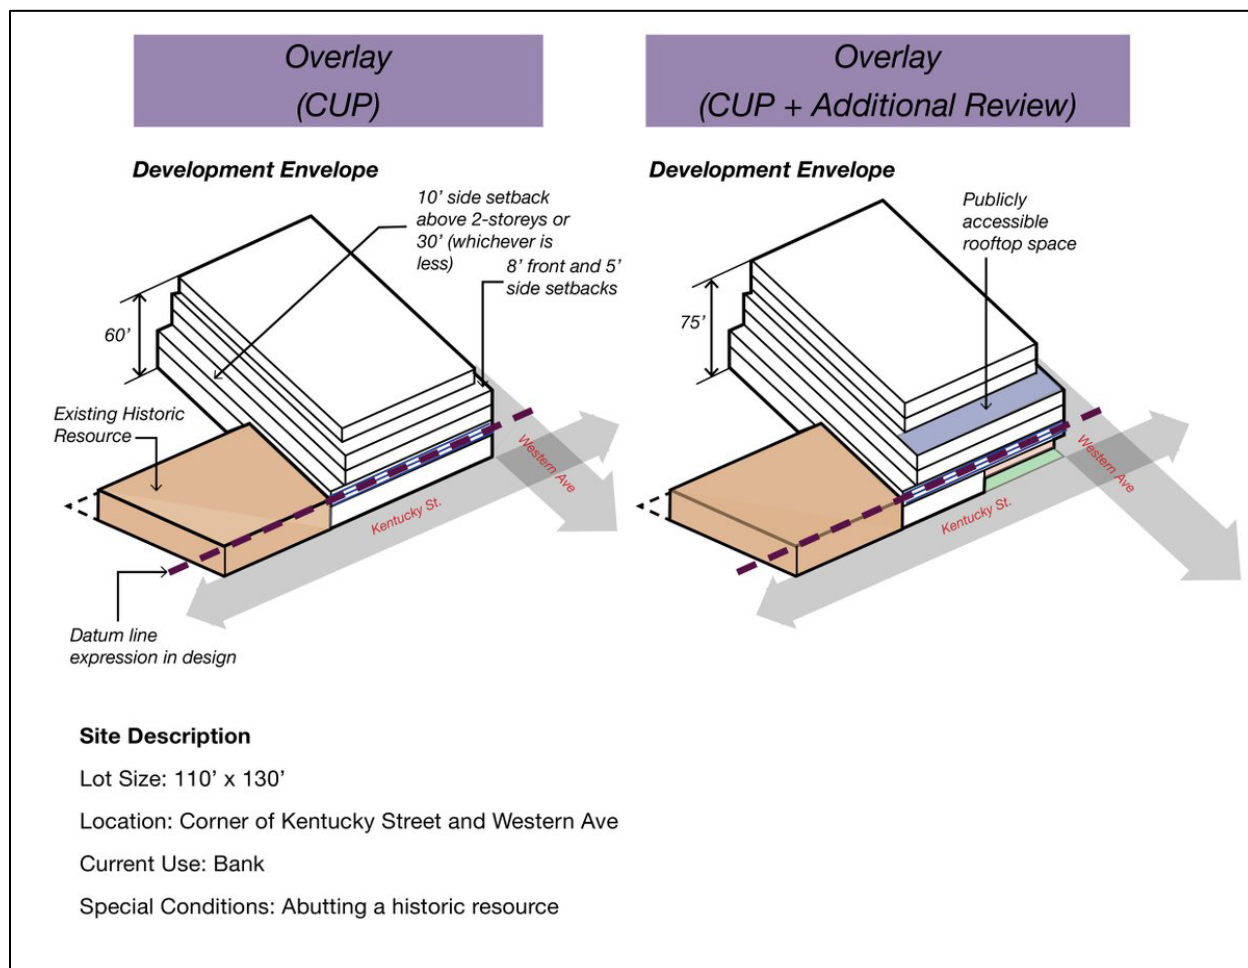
Treatment of new construction adjacent to a historic building, July 2023C
